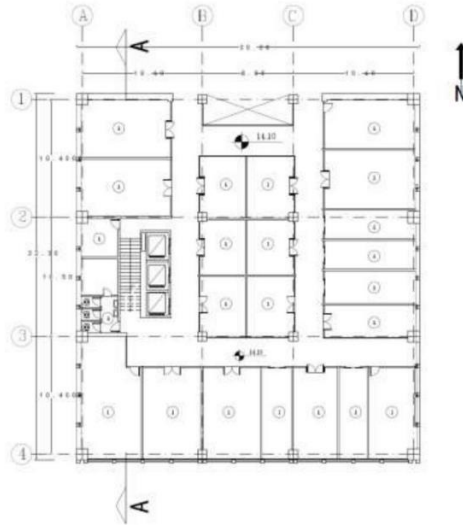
The layout of the 14th floor of the tower (Govt. of Iran (2017)).
